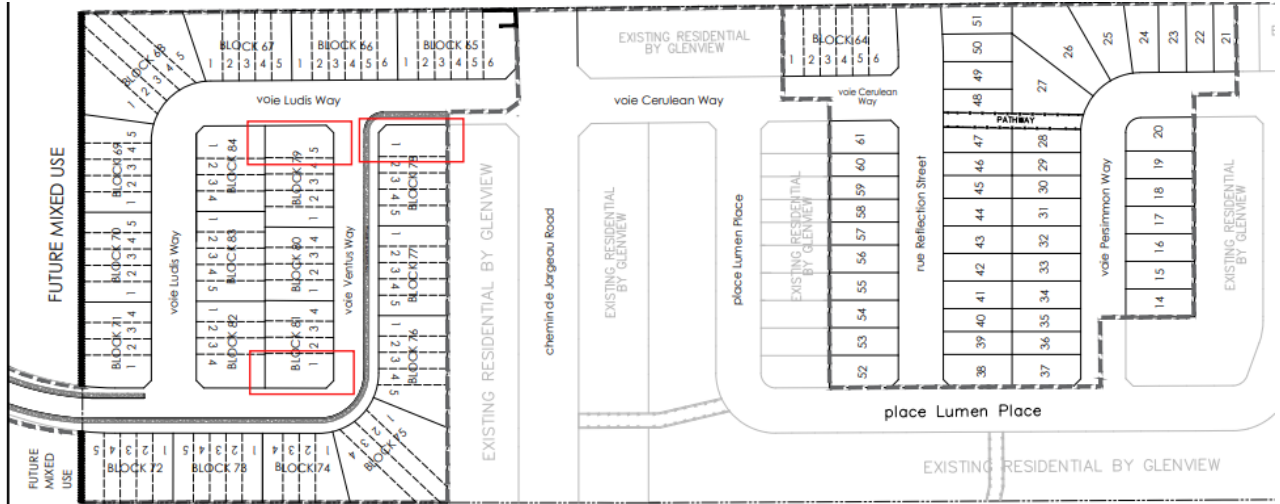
Excerpt from Site Plan showing the three dwelling units requiring relief from front yard setback.
